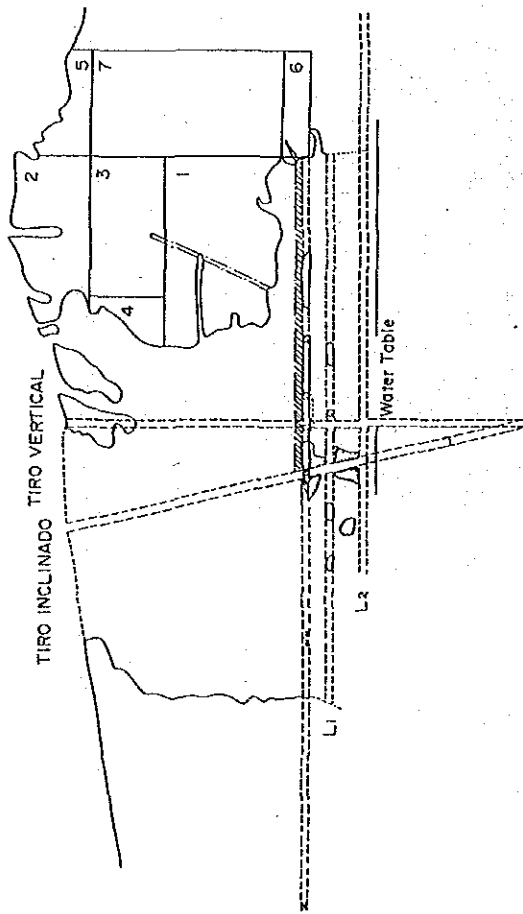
a Barradon -Plane and Longitudinal Section-
